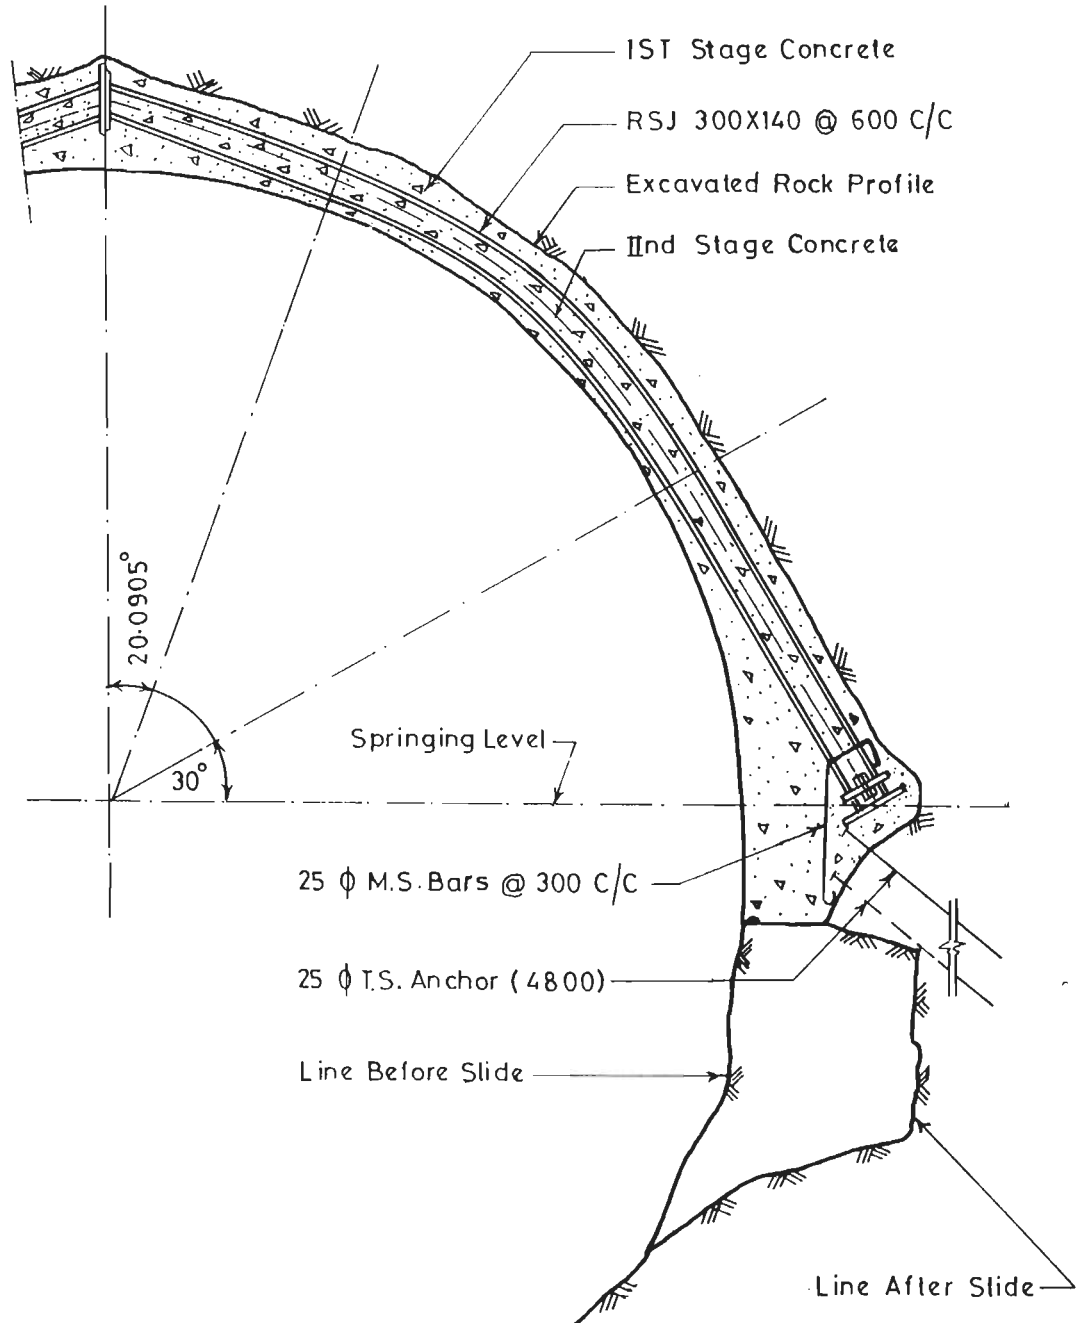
Undermining Of Overt Lining In Right Bank Diversion Tunnel T-4
